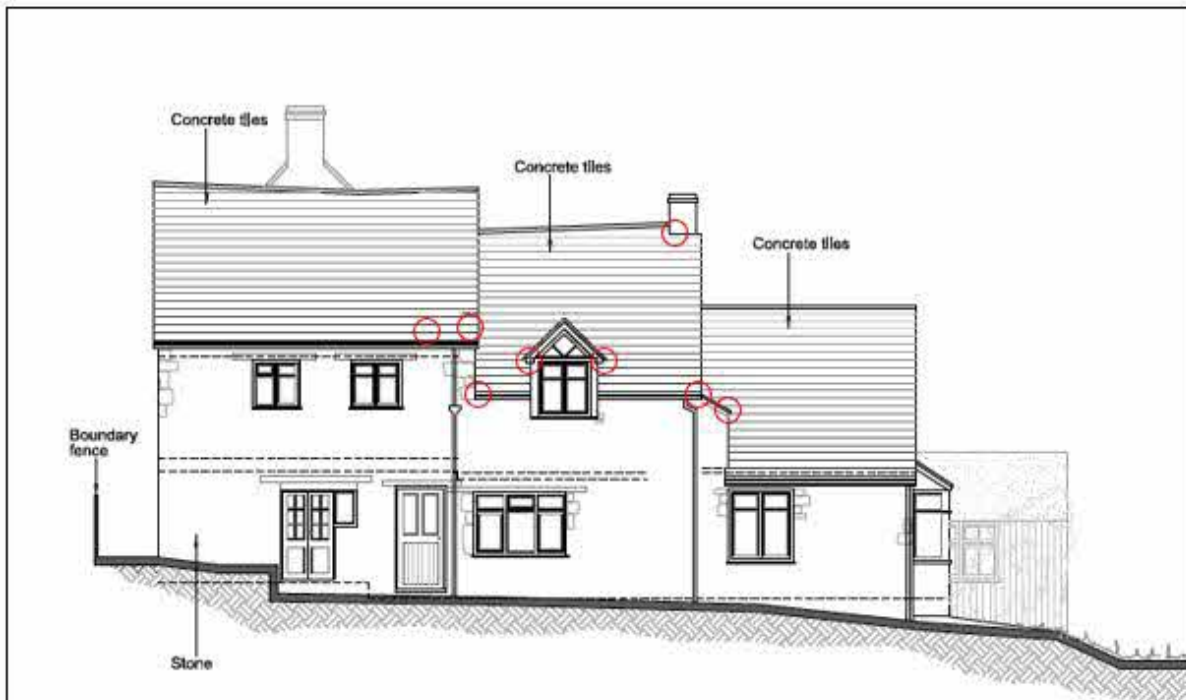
Potential roost features for crevice-dwelling bats. South elevation
